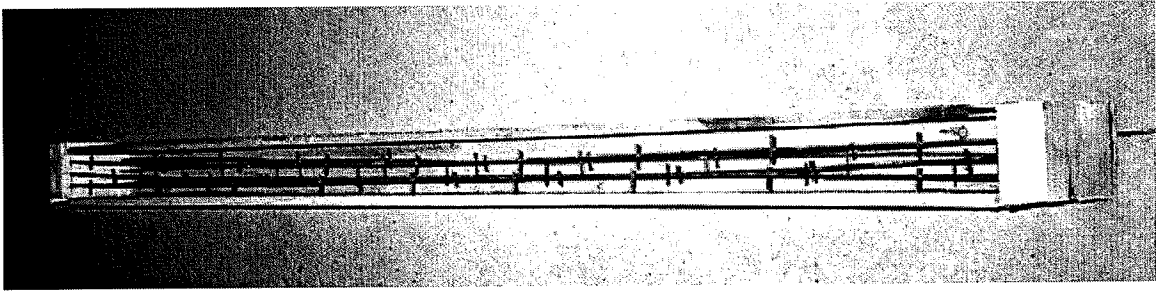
The Formwork and Reinforcement Cage for the Reinforced Concrete Element.
